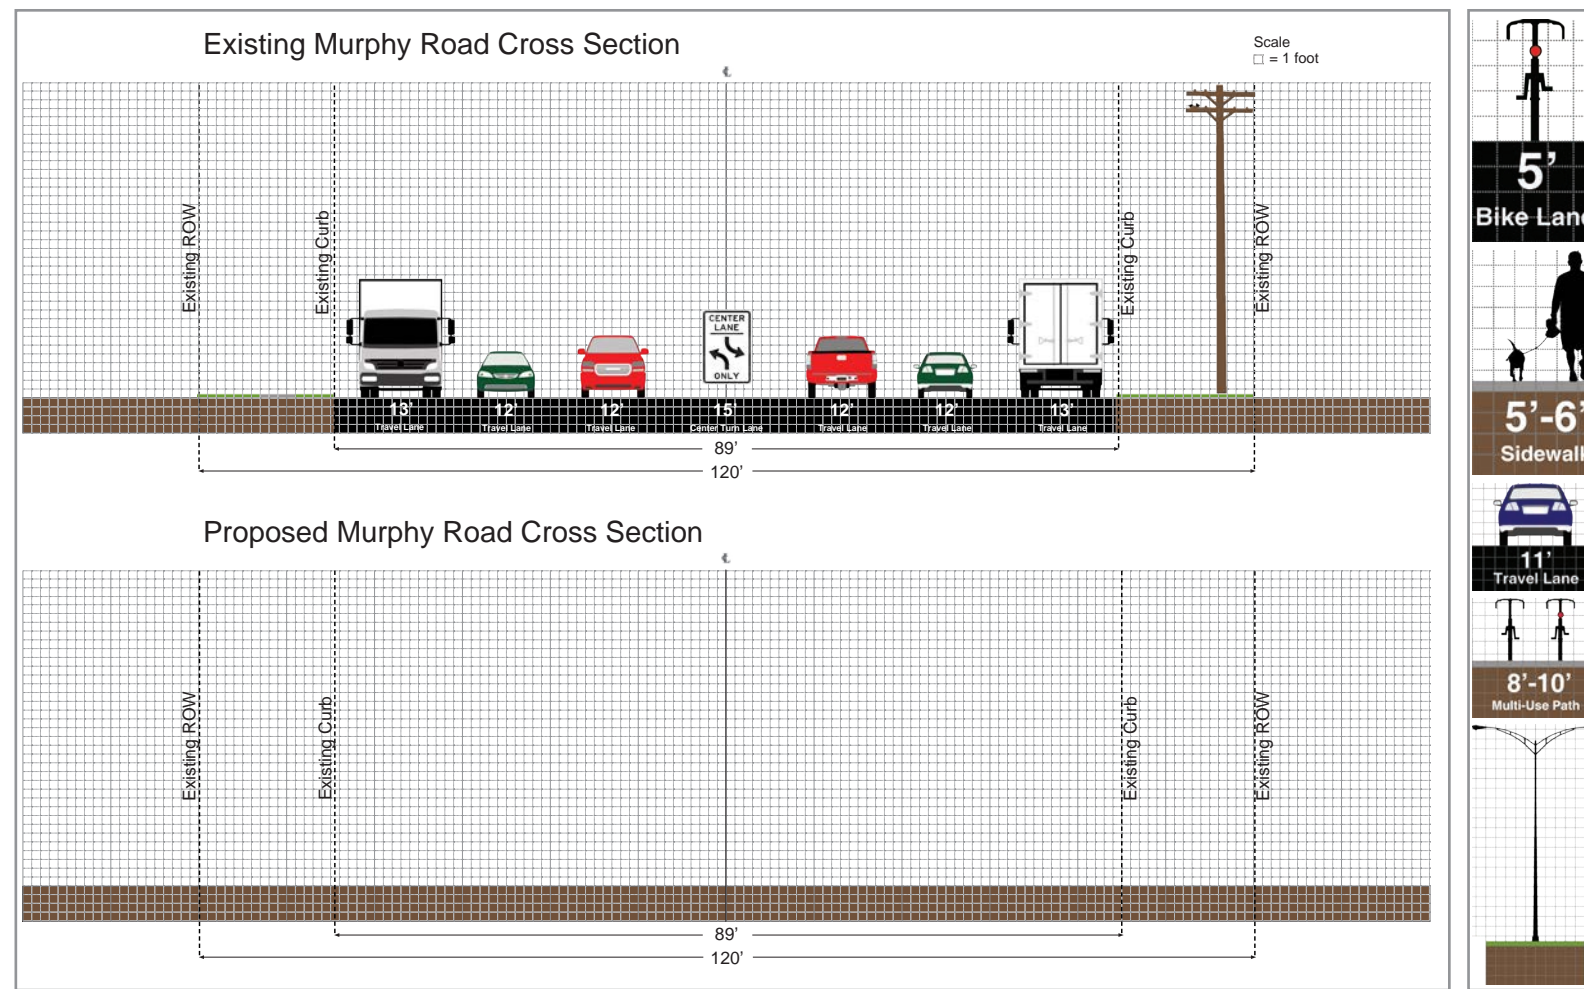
Steering Committee Cross-section Development Workshop Board
